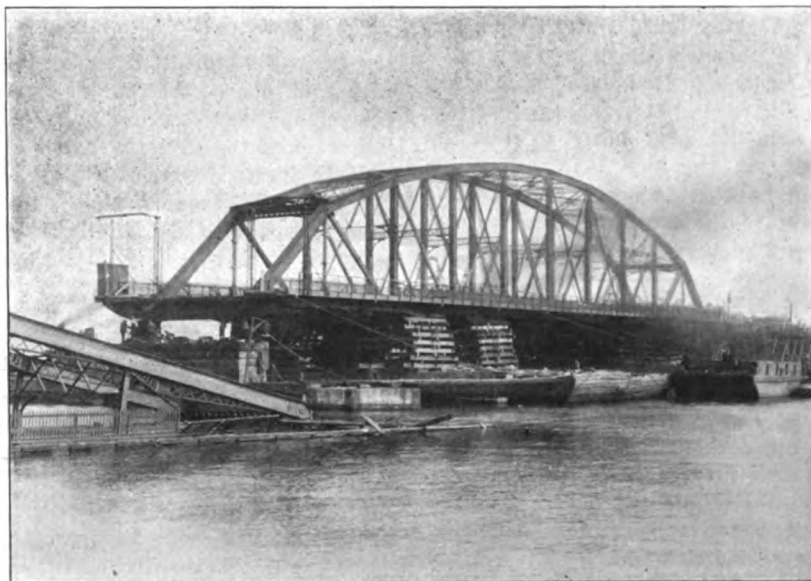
SHOWING ARRANGEMENT OF SCOWS UNDER BRIDGE, TIMBERED UP TO BRIDGE, AND THE SPAN ABOUT A FOOT CLEAR OF STONE ABUTMENTS.
